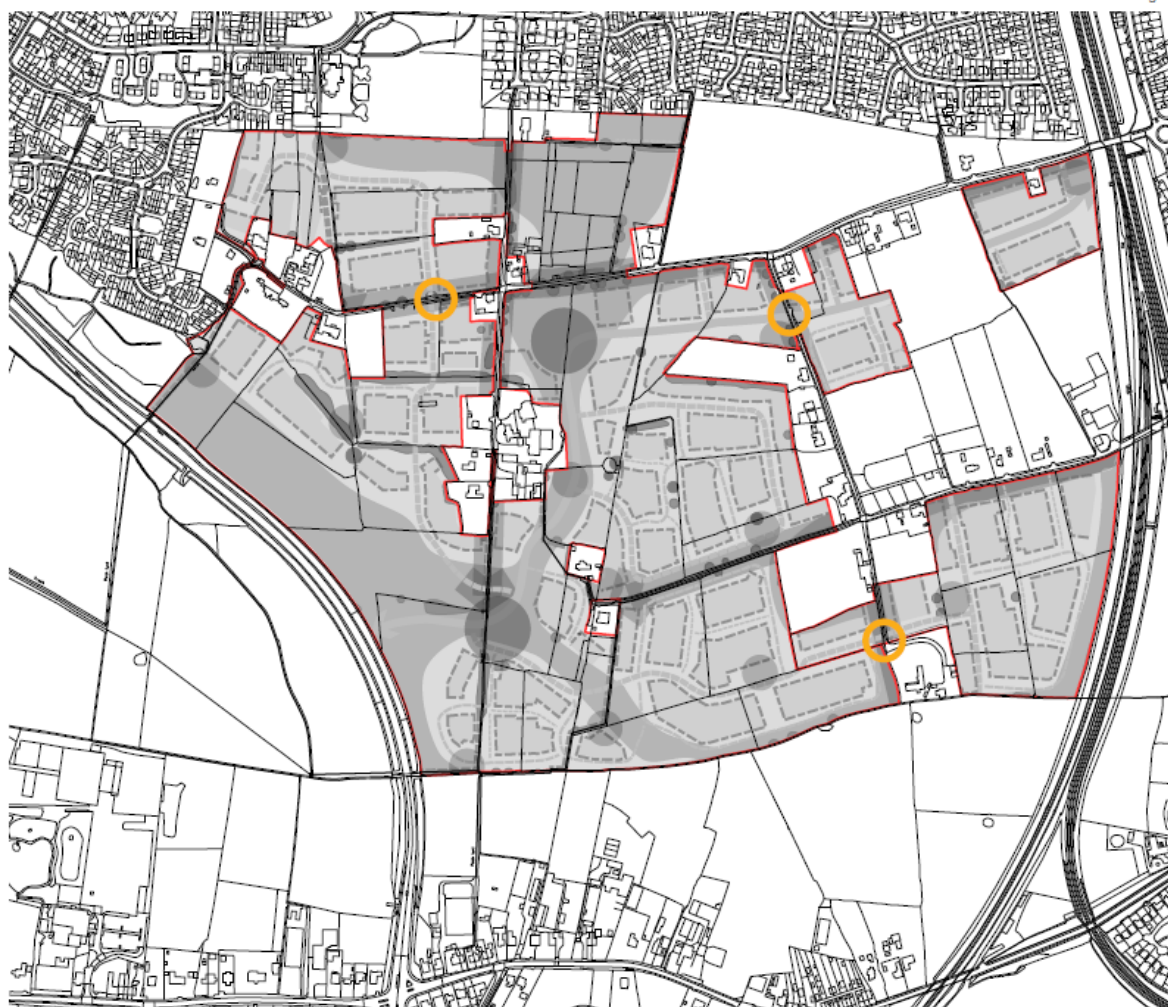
Locations where new roads cross existing lanes (Page 44 of DAS CD1.17)
